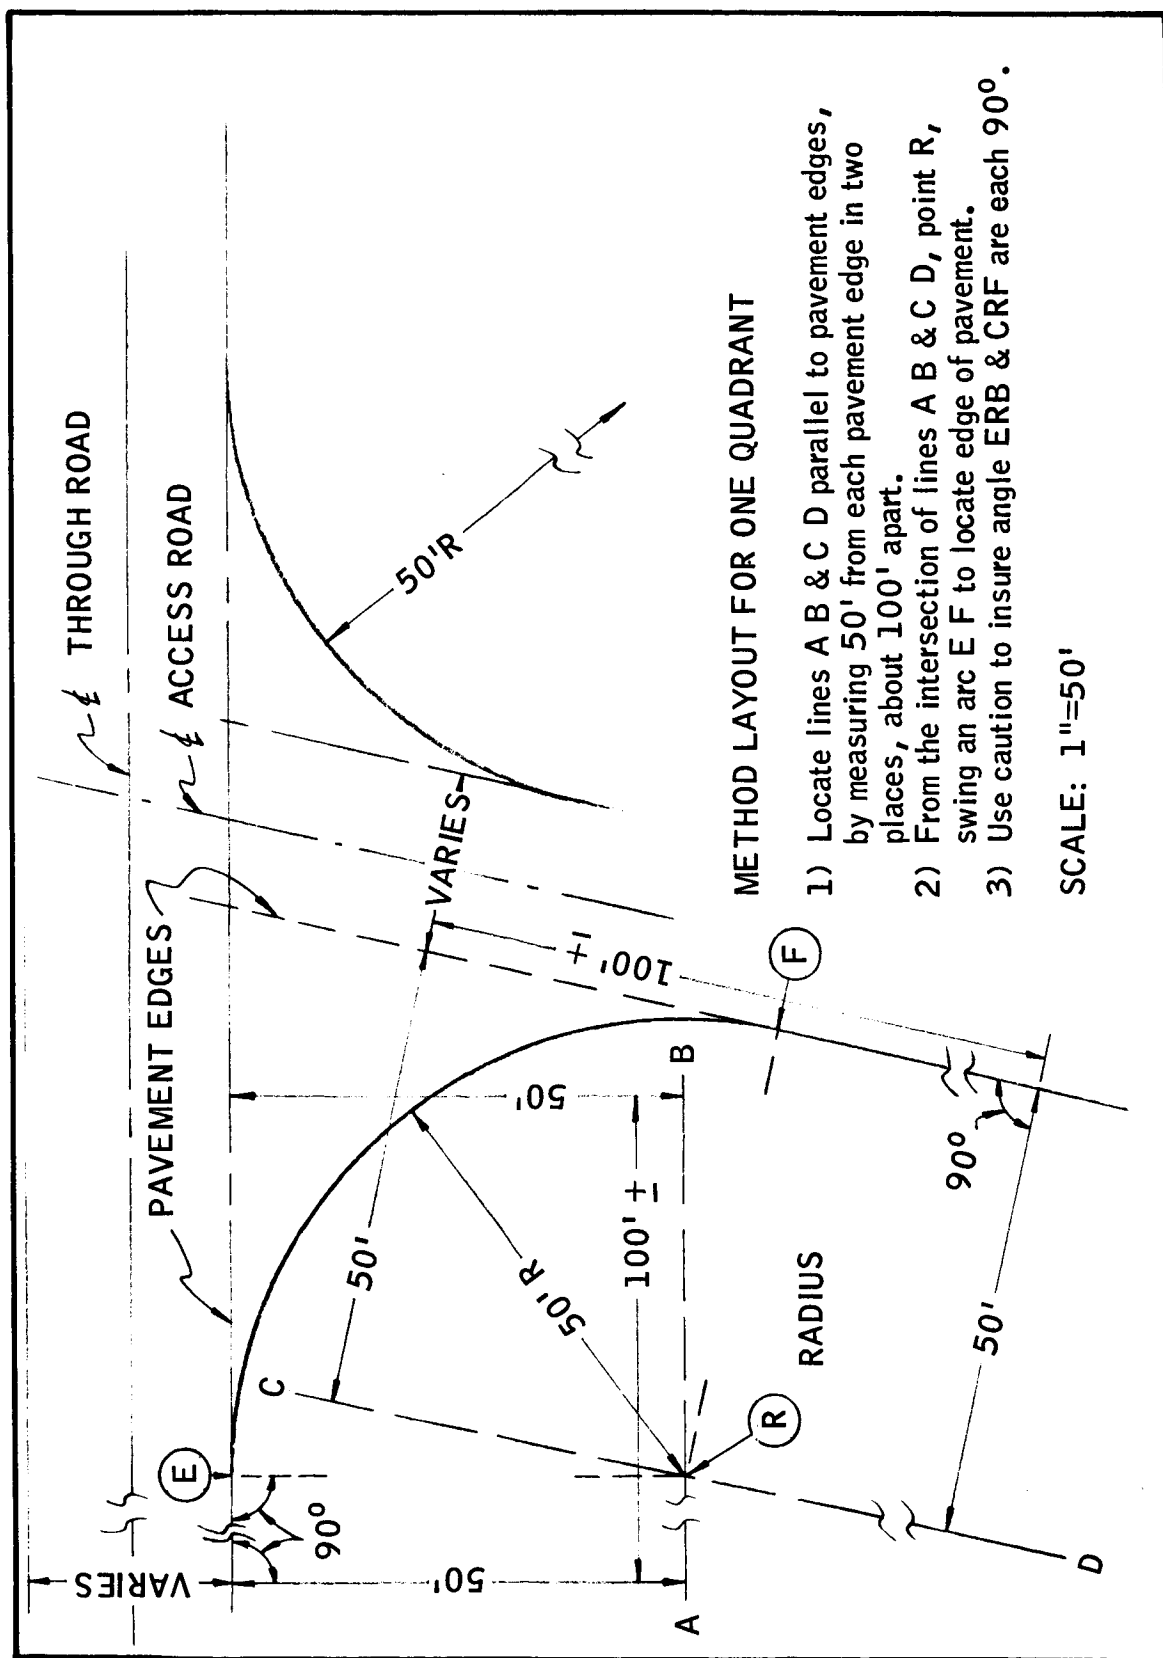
Intersection Layout When Roads are not at Right Angles
